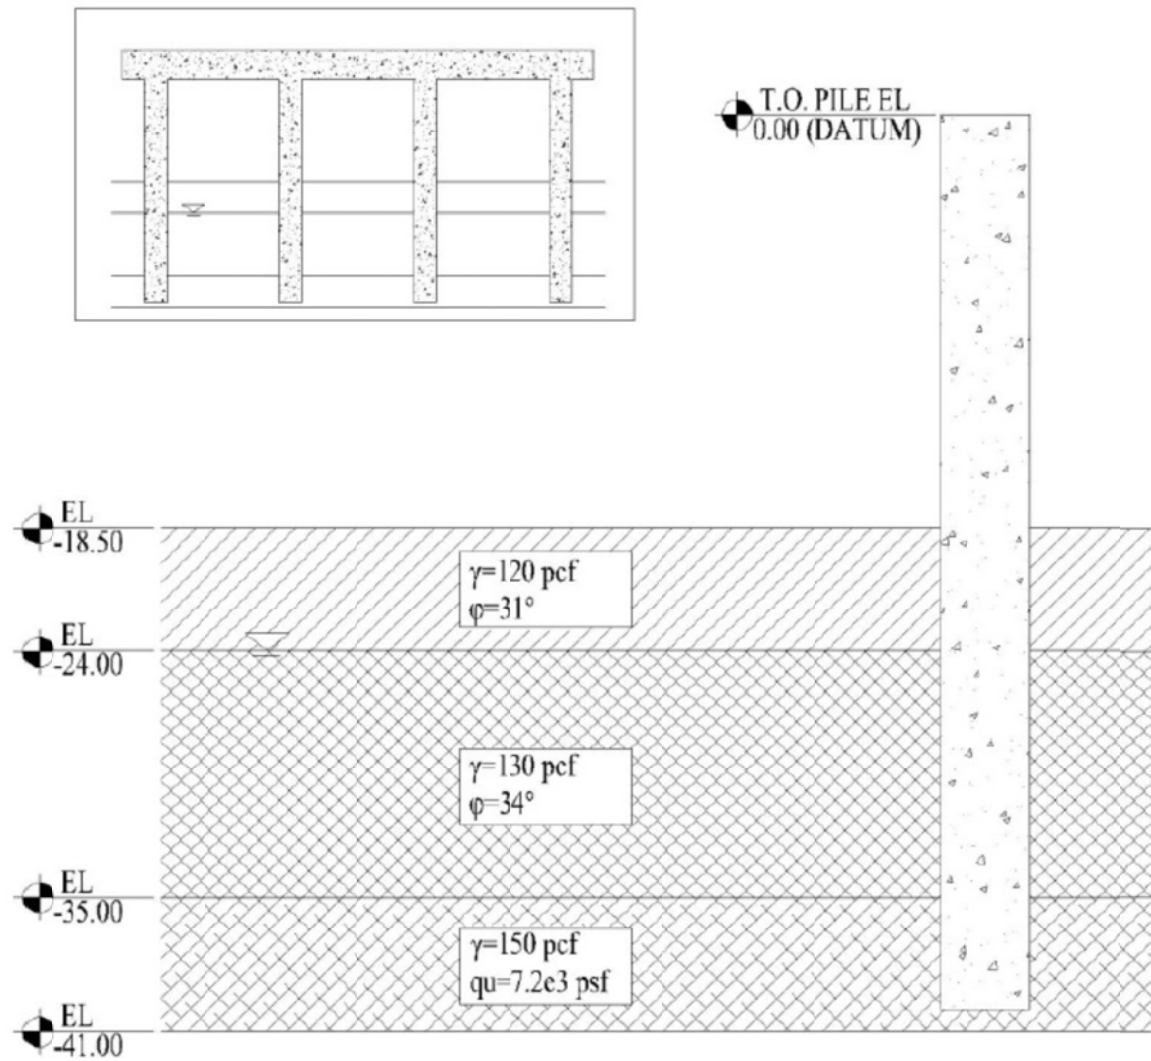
MultiPier model--Rowan County bridge model for single drilled shaft and the bridge bent (inset).
